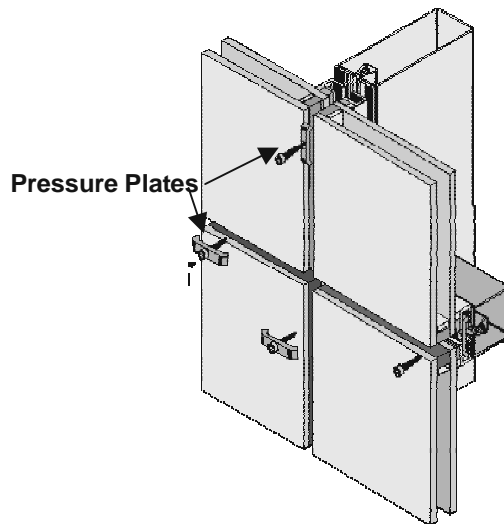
CURTAIN WALLING - PRESSURE PLATES
